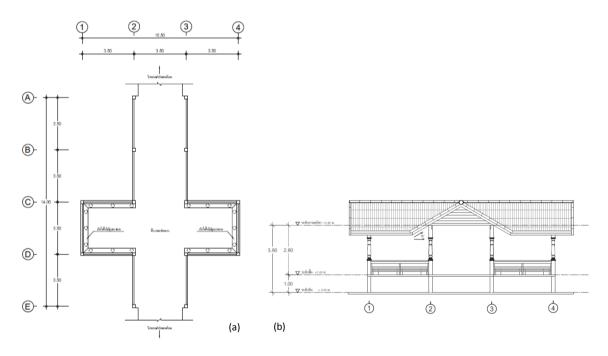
(a) Floor Plan; (b) Front Section of the Pavilion
